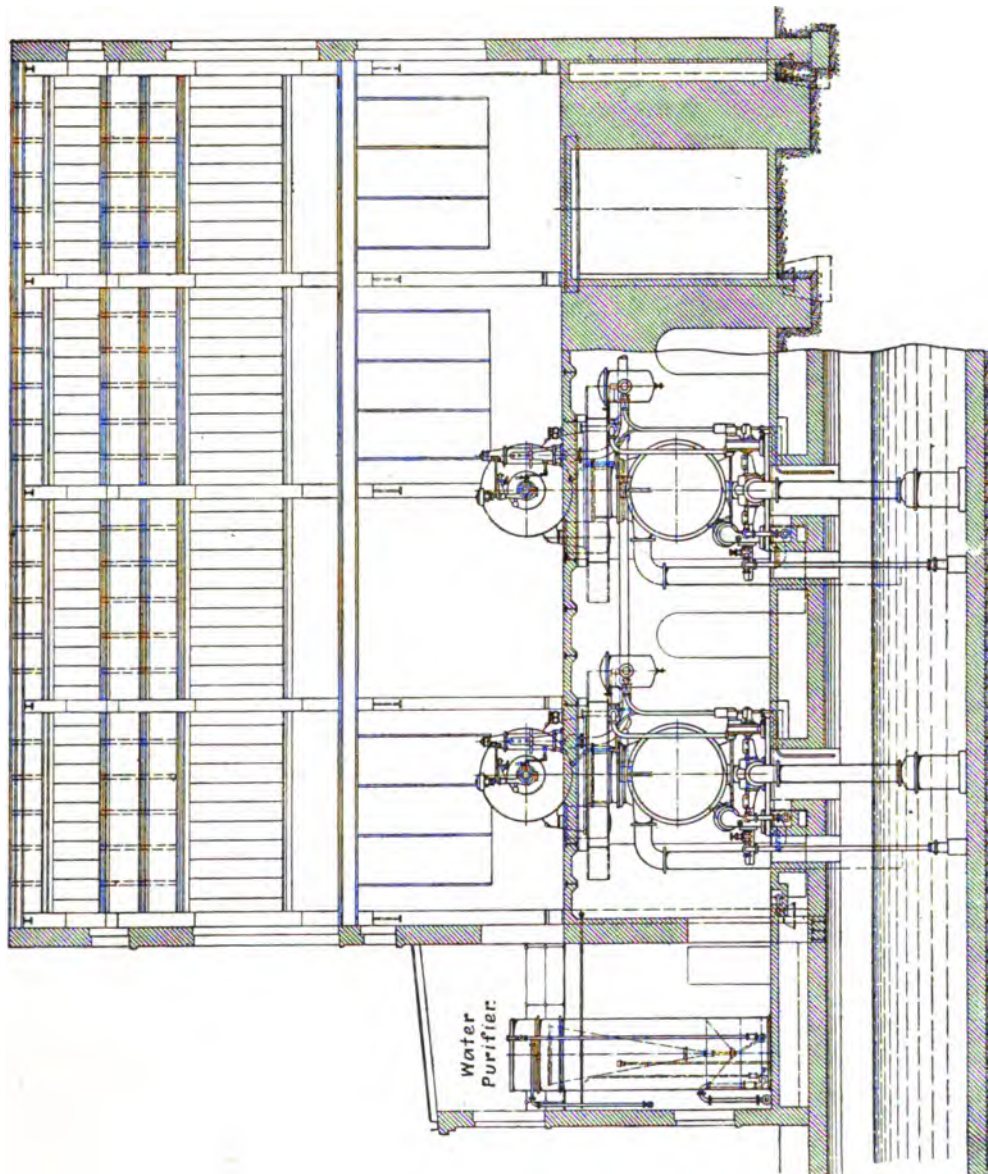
Section through Engine_Room. Scale, 1 to 200
